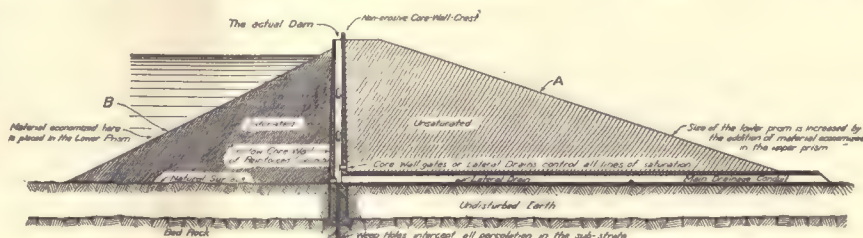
Section of Earth Fill Dam with Hollow Core Wall.
